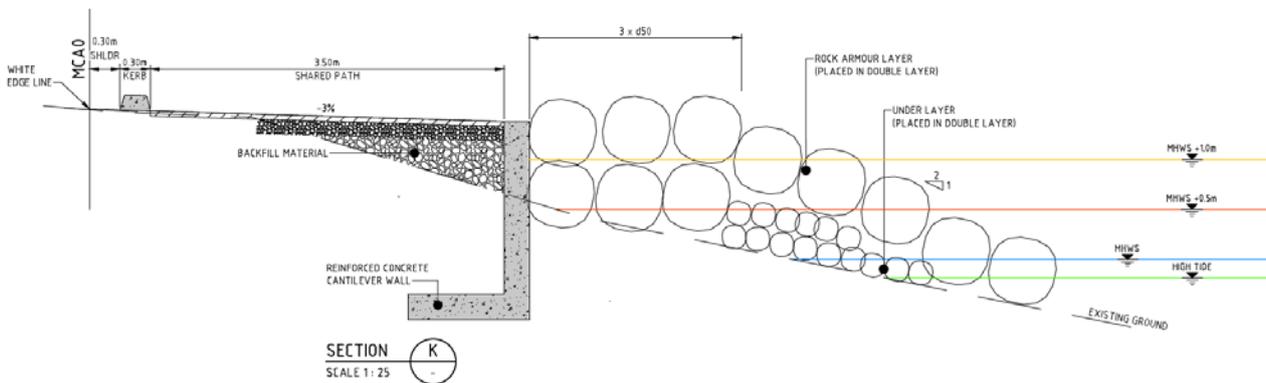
Typical revetment with reinforced concrete cantilever wall
